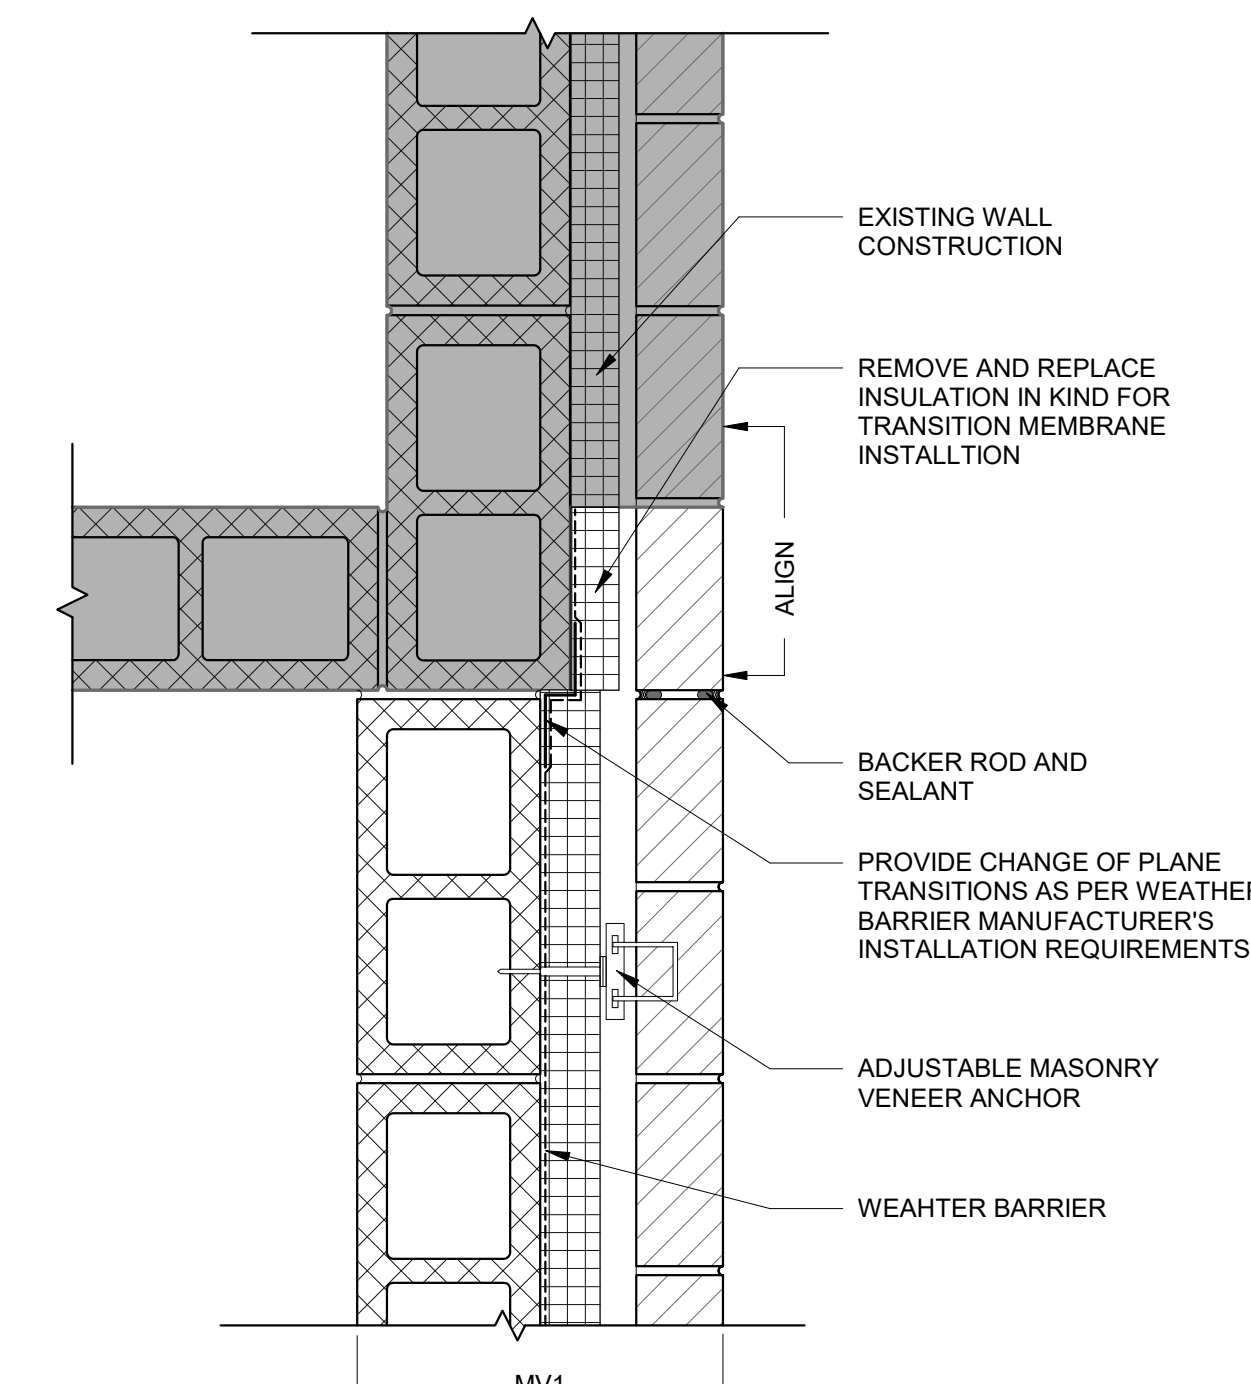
Typical Masonry Veneer Detail. This cross-sectional diagram illustrates the assembly of a masonry veneer over a concrete or masonry substrate. The substrate is shown with a 4-inch thickness. A weather barrier is applied to the exterior face of the substrate. Adjustable masonry veneer anchors are embedded into the substrate and extend through the weather barrier to secure the veneer. The veneer itself is composed of masonry units (bricks or blocks) with mortar joints. The diagram also shows the interior finish, which includes a layer of sealant and a reinforced concrete or masonry core. Labels indicate the weather barrier, adjustable masonry veneer anchor, sealant, and reinforced concrete core.
